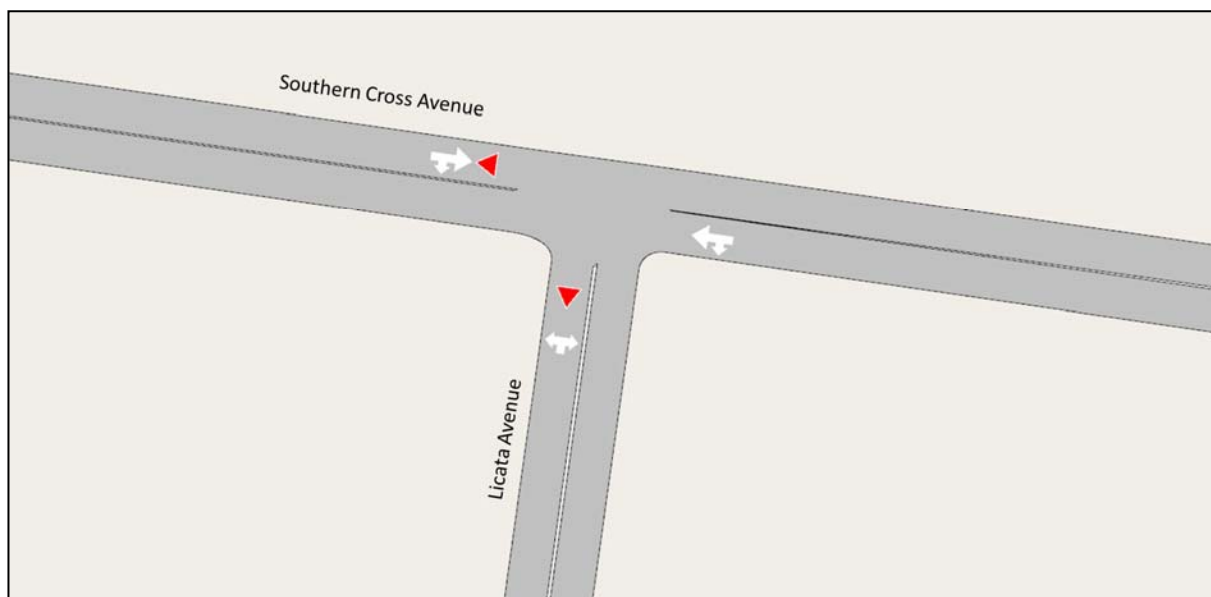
Indicative Intersection Arrangement – Southern Cross Avenue x Licata Avenue
